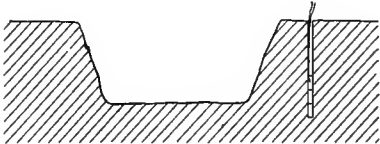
METHOD OF LOADING TO WIDEN A ROAD CUT. ELECTRIC FIRING IS ADVISED
